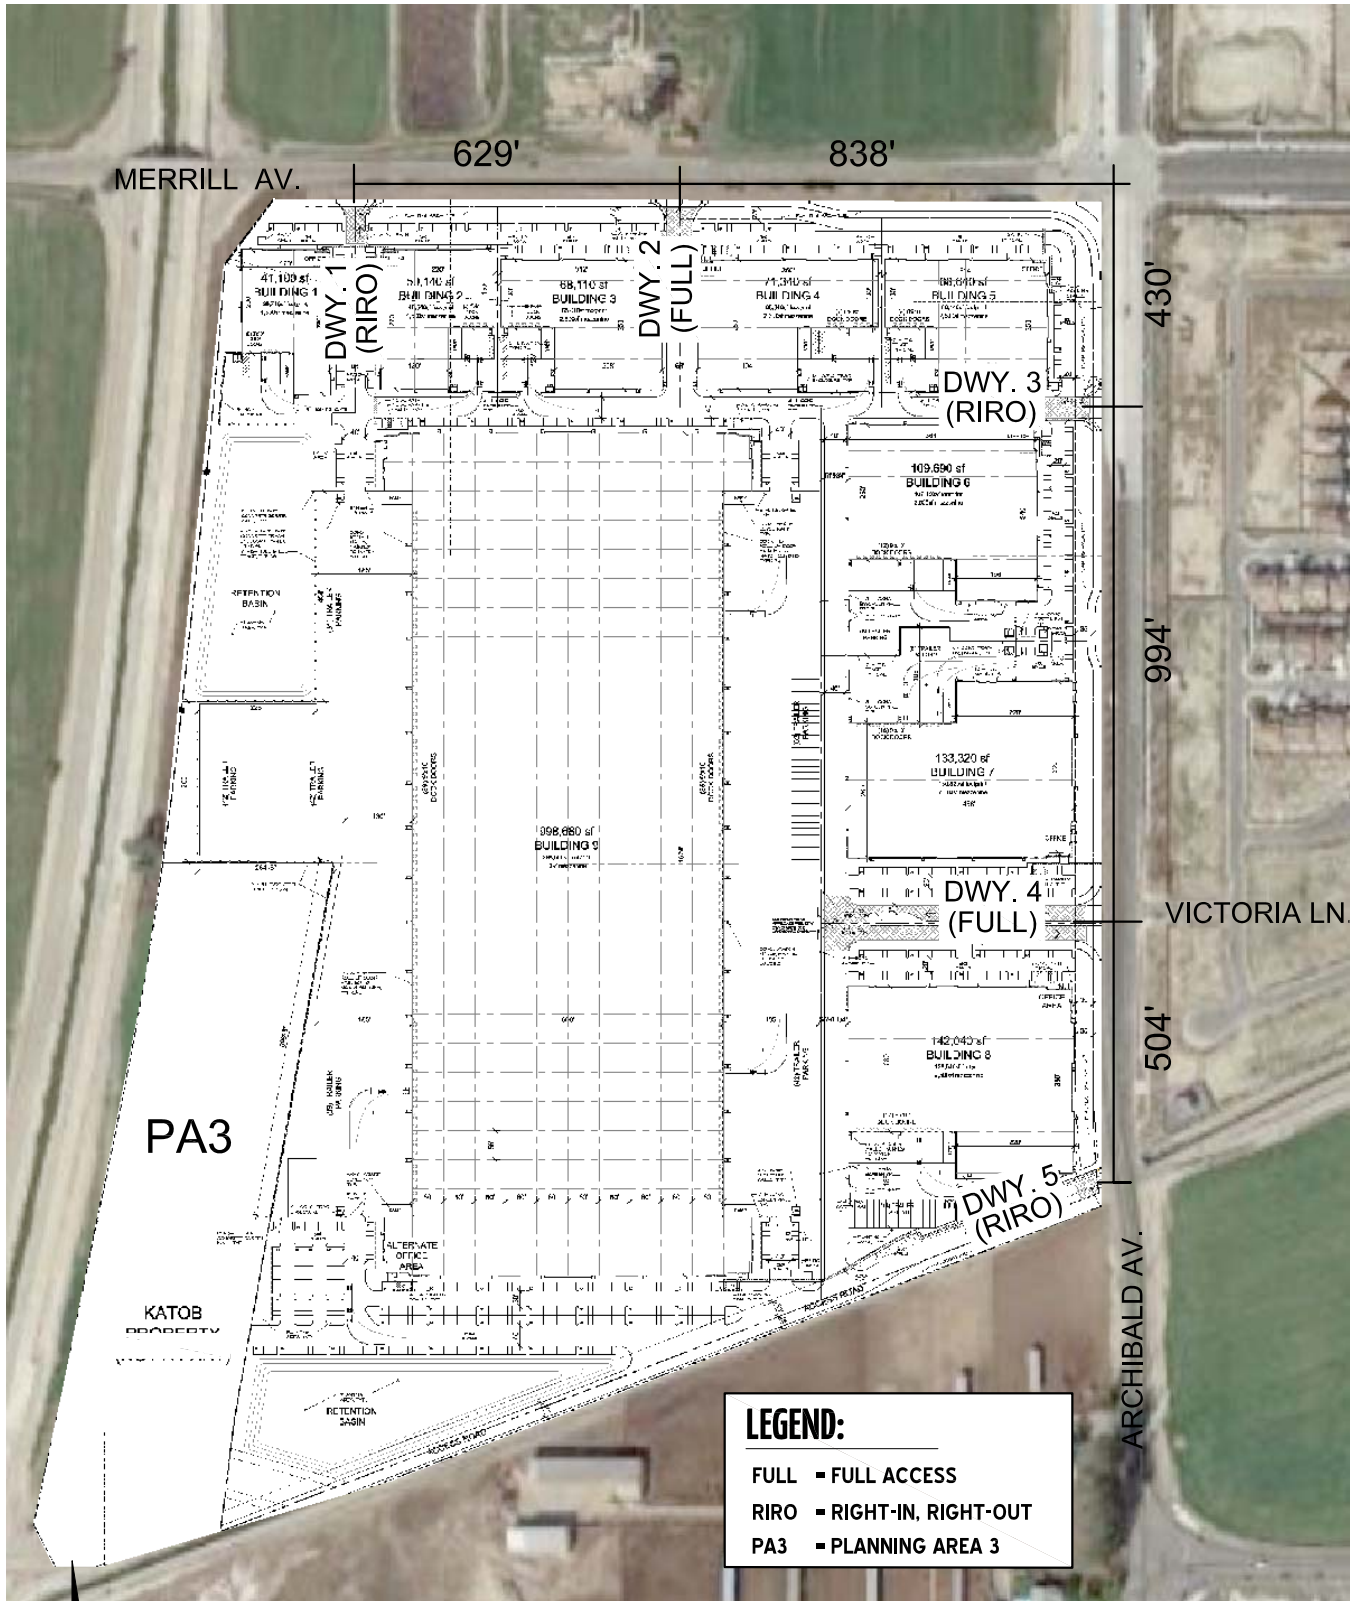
illustrates the preliminary Project site plan. The proposed Project would develop and operate the Colony Commerce Center East Specific Plan. The Specific Plan contains three Planning Areas. Planning Area (PA) 1 and PA2 of the Specific Plan is anticipated to be operational by 2019. The remaining PA3 is proposed to be developed with up to 231,195 square feet (sf) of industrial use; however, the timeline for development is unknown, and dependent upon economic conditions and full occupancy of PA1 and PA2. However, this analysis assumes that PA-3 would be developed and operational by 2040.
